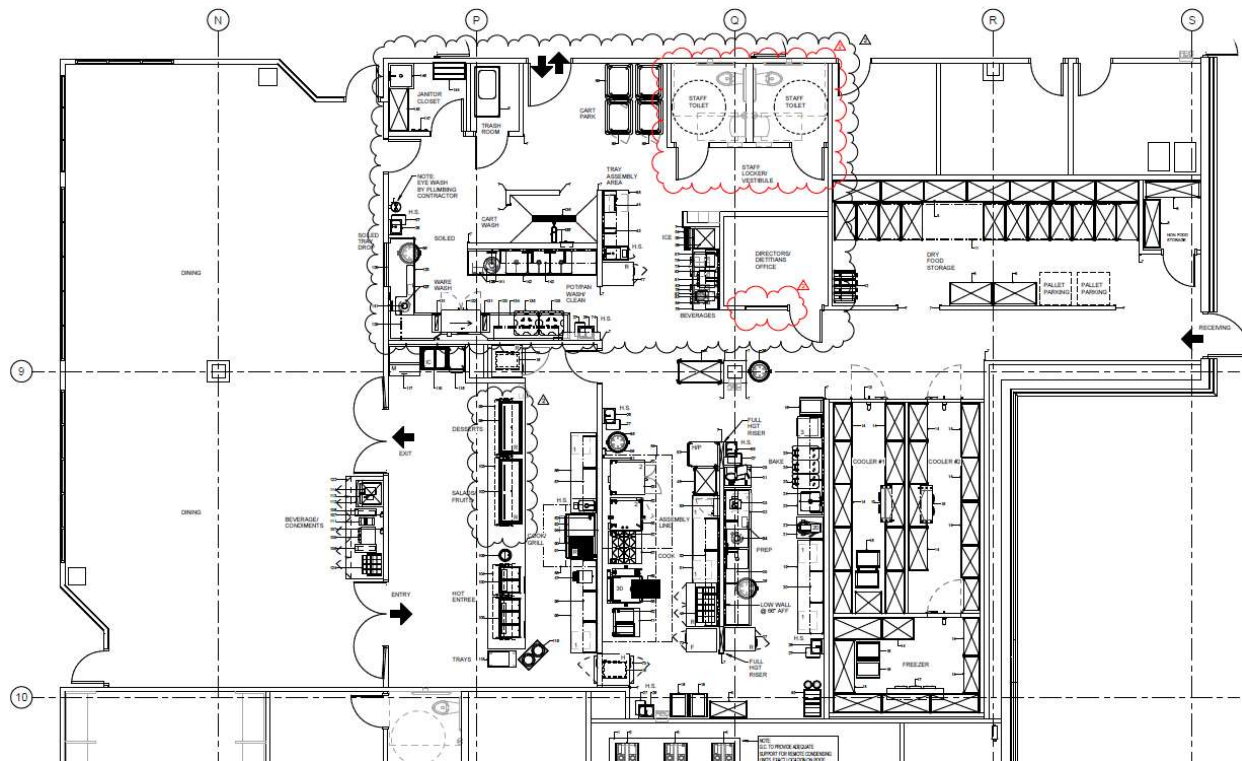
Example of Enlarged Floor Plan showing equipment and dimensions
